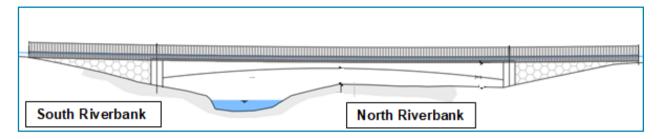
Elevation and riverbanks of Tolka Valley Park Bridge
